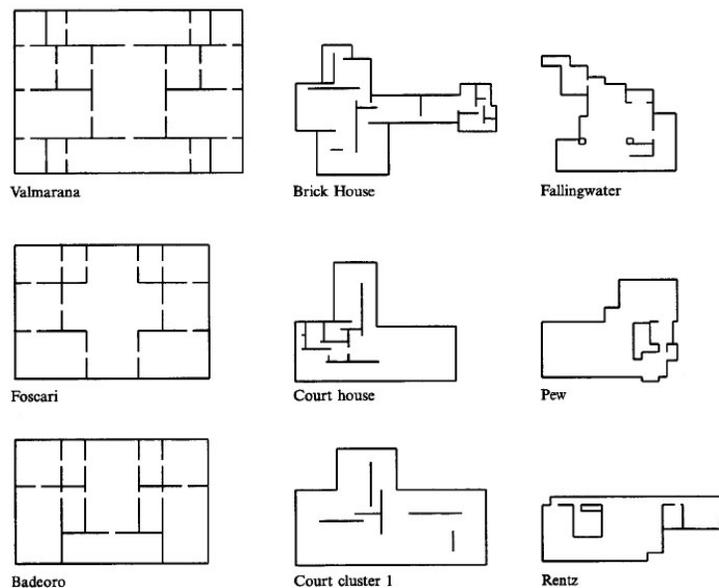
A sample of the plans analyzed by Peponis et al.,(1998): first column on the left shows the samples for 'cellular plan', the middle column shows the examples of 'free plans' and the third column (on the right) shows the 'open plan'.
